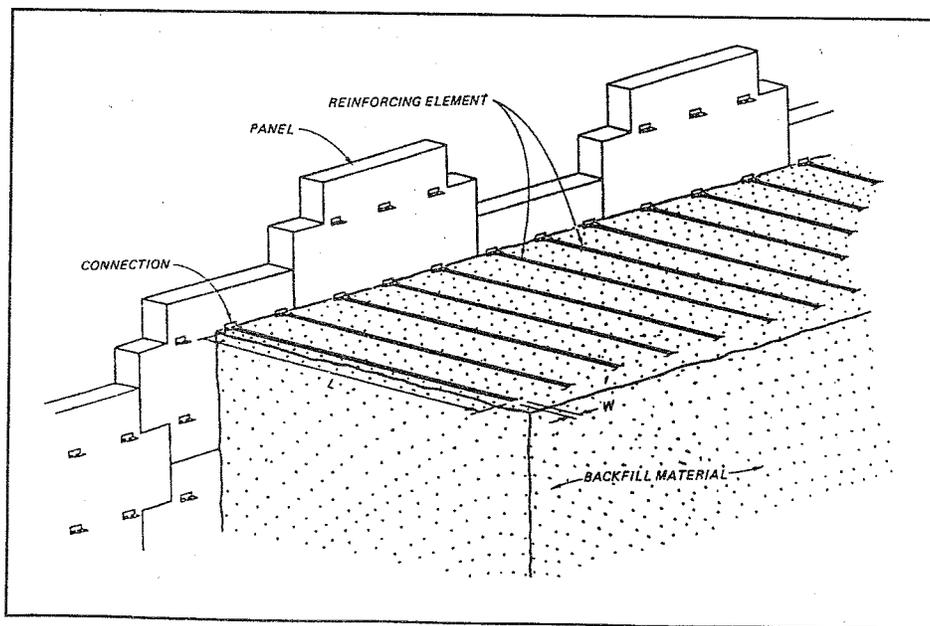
Diagram of reinforced earth retaining wall, a mechanically stabilized backfill system
